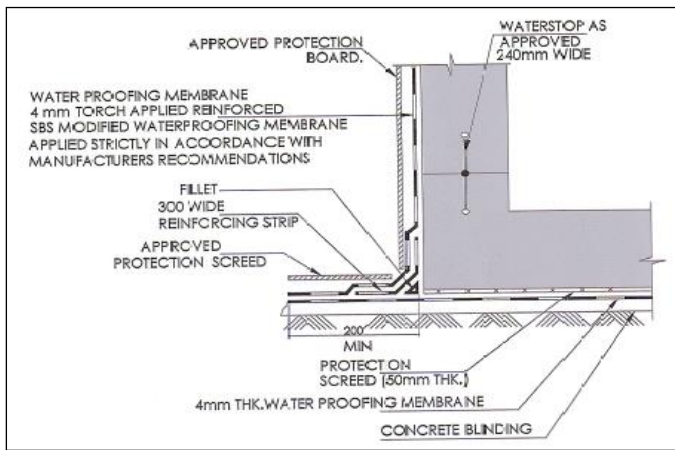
Waterproofing system bottom of Mat Slab connected with vertical
